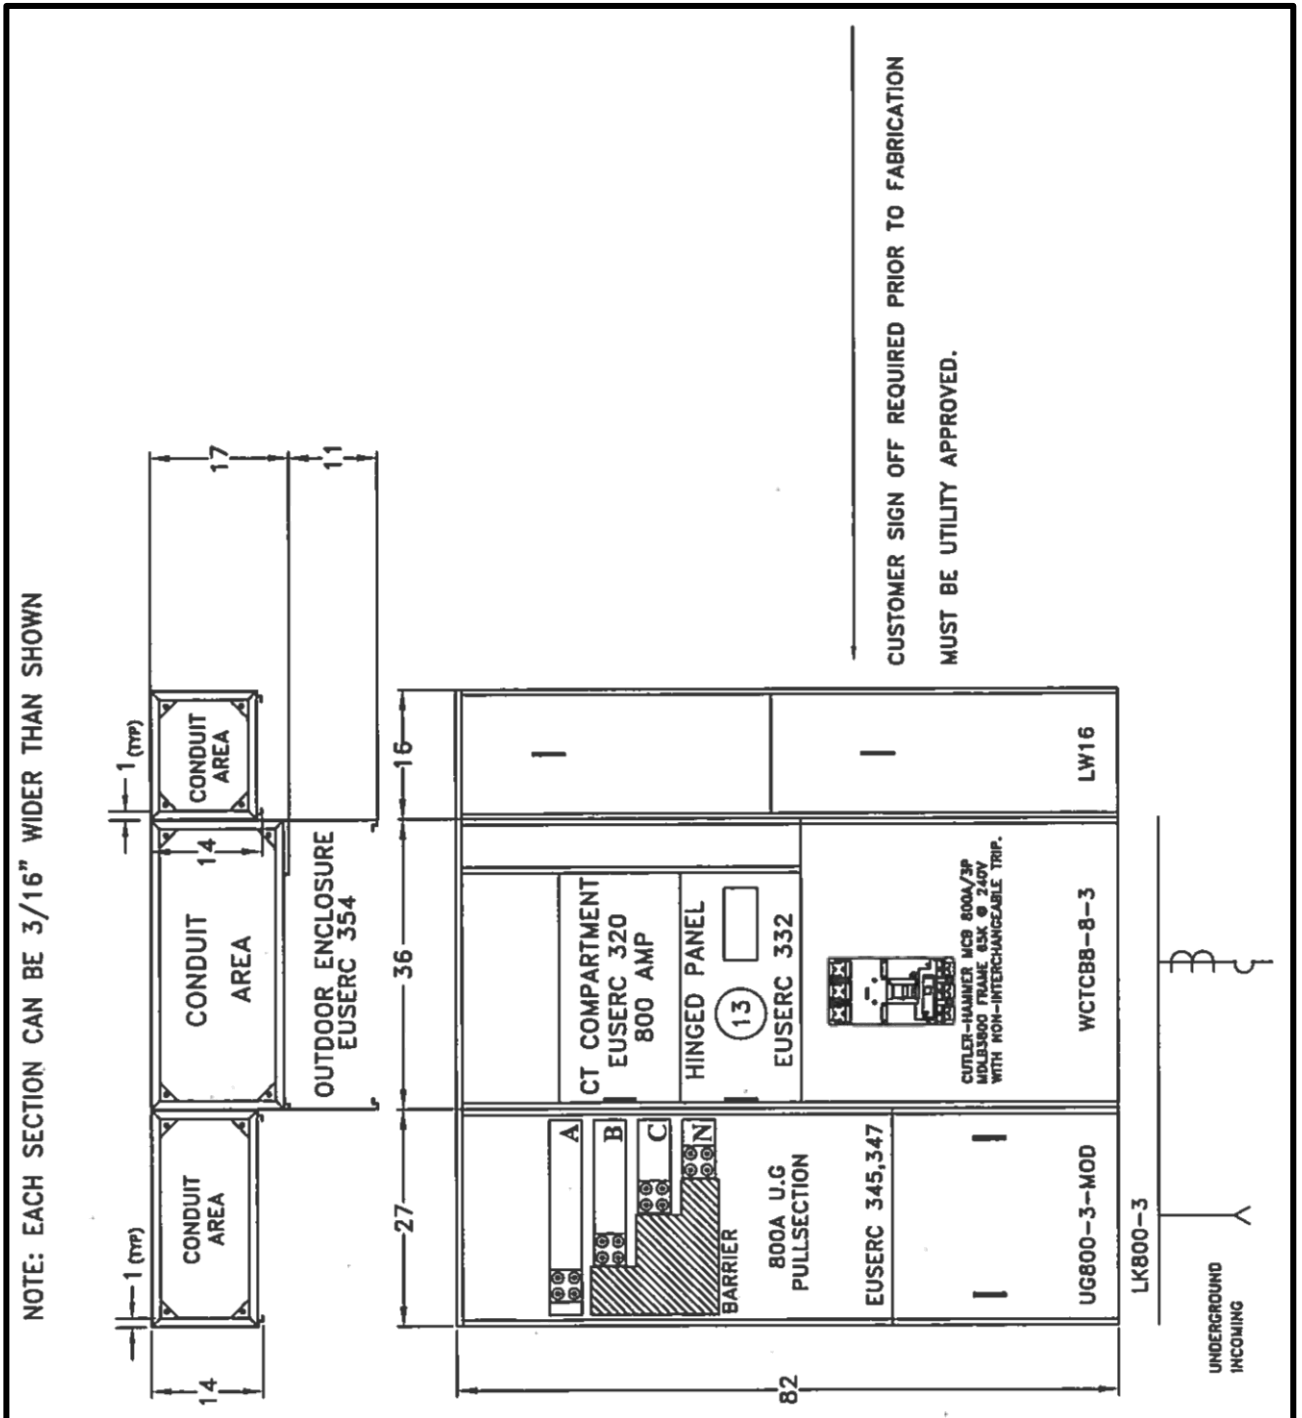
Sample Cut Sheet - 800 Amp Breaker.
